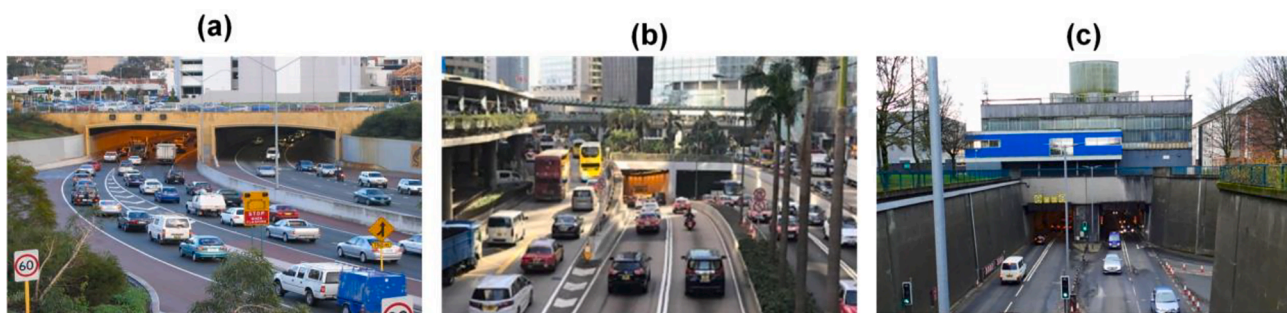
Typical buried box-shaped road tunnels in urban area, (a) Northbridge tunnel in Perth, Australia (from website (1)), (b) Pedder Street tunnel in Hong Kong, China (from website (2)), and (c) Clyde-tunnel in Glasgow, UK (from website (3)). (1) https://en.wikipedia.org/wiki/Graham_Farmer_Freeway. (2) <https://zh-yue.wikipedia.org/wiki/File:Connaught-Road-Central-near-Pedder-Street-Tunnel-West-End.jpg>. (3) <https://www.reglasgow.com/massive-investment-needed-in-clyde-tunnel-and-approach-roads/>.
